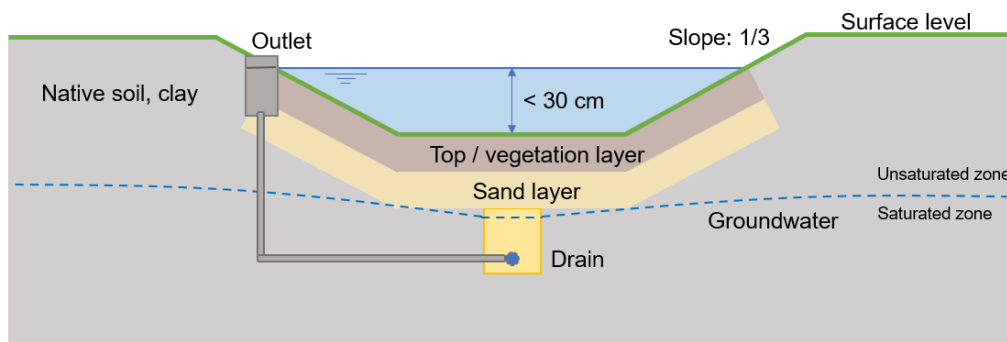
Cross section of typical bioswale design in Rotterdam
